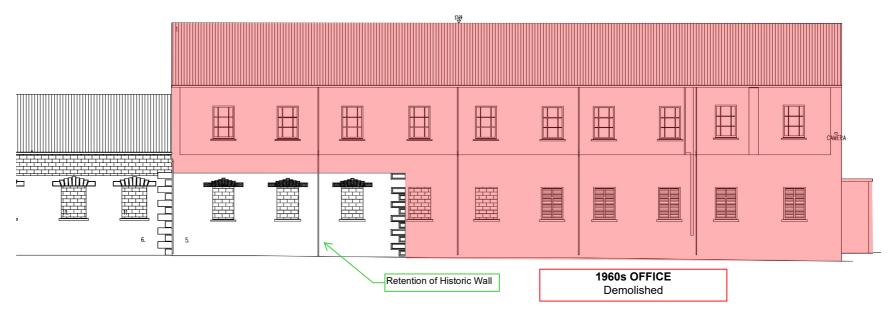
Element of Cheese Plant Office Wall being retained - North Circular Road Elevation
